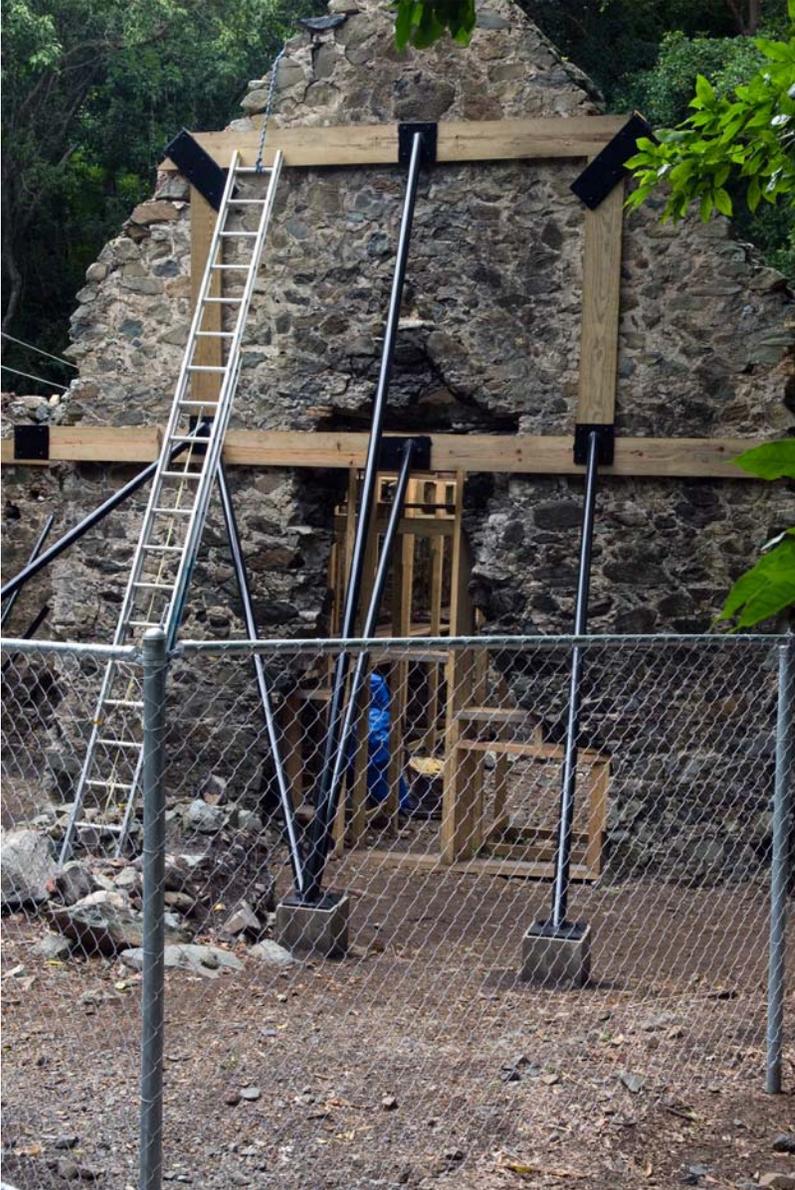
Outrigger beams support the exterior walls. (photograph by Luran Riser 2009).
